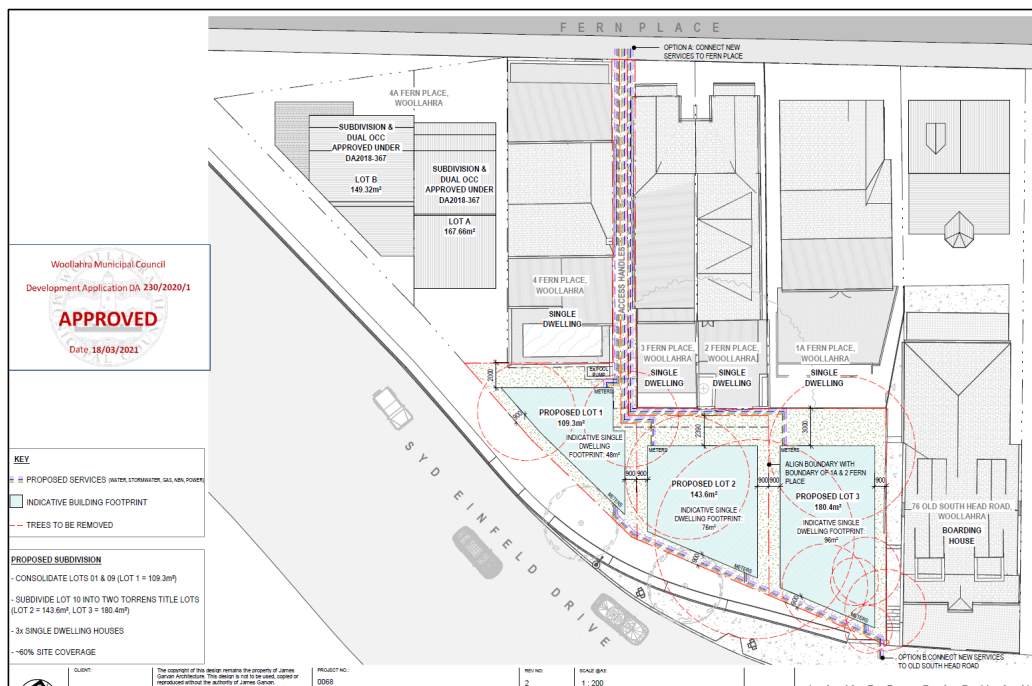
Approved Subdivision Site Plan – indicative building footprint (DA 230/2020/1)
